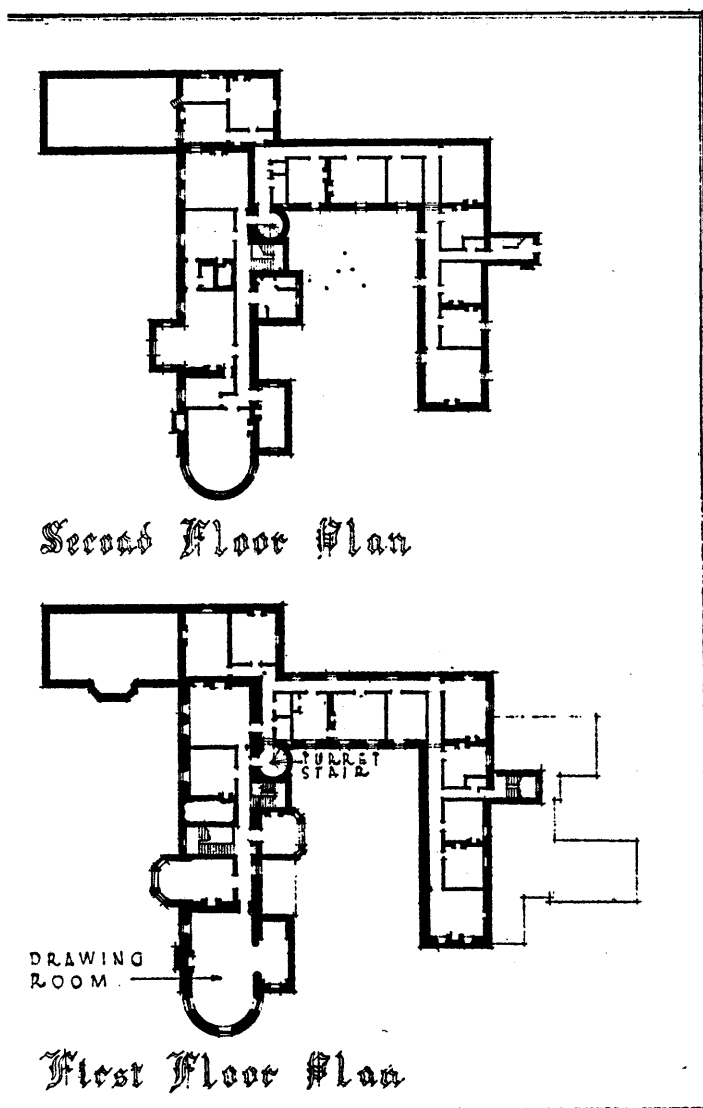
MAXWELTON HOUSE—PLAN OF UPPER FLOORS.
